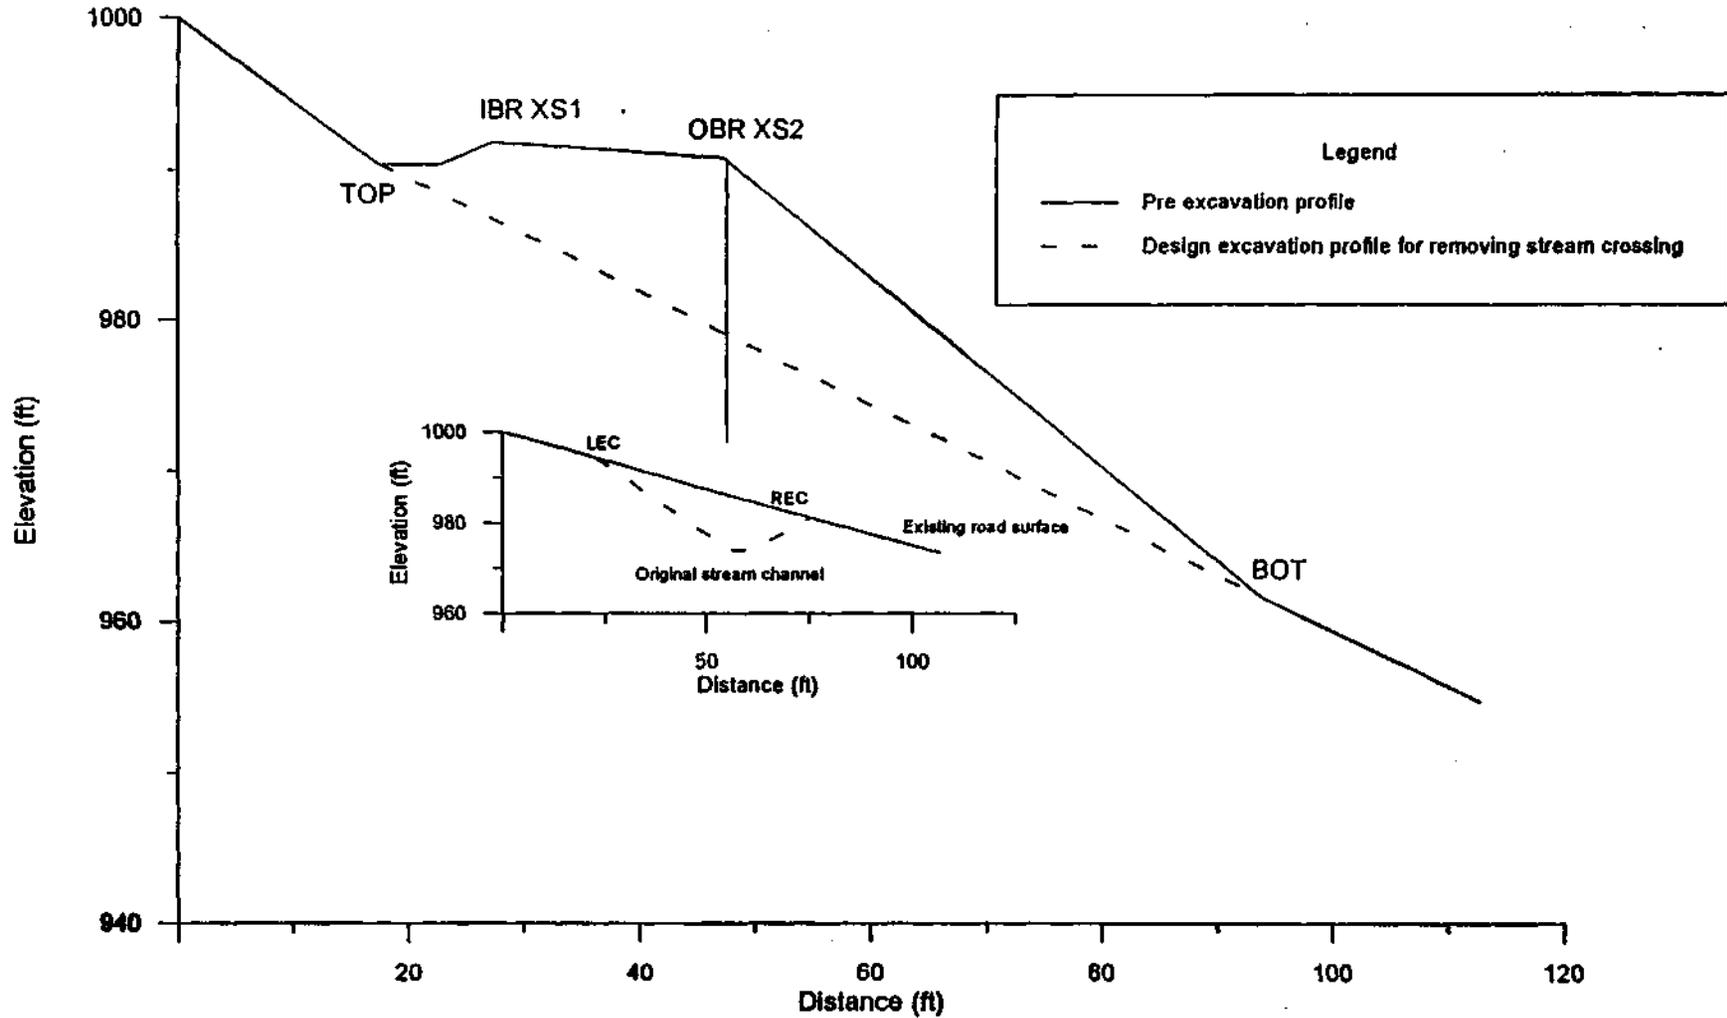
Ashton Road: Site 5A Stream Crossing Pre & Design Excavation Profiles.
